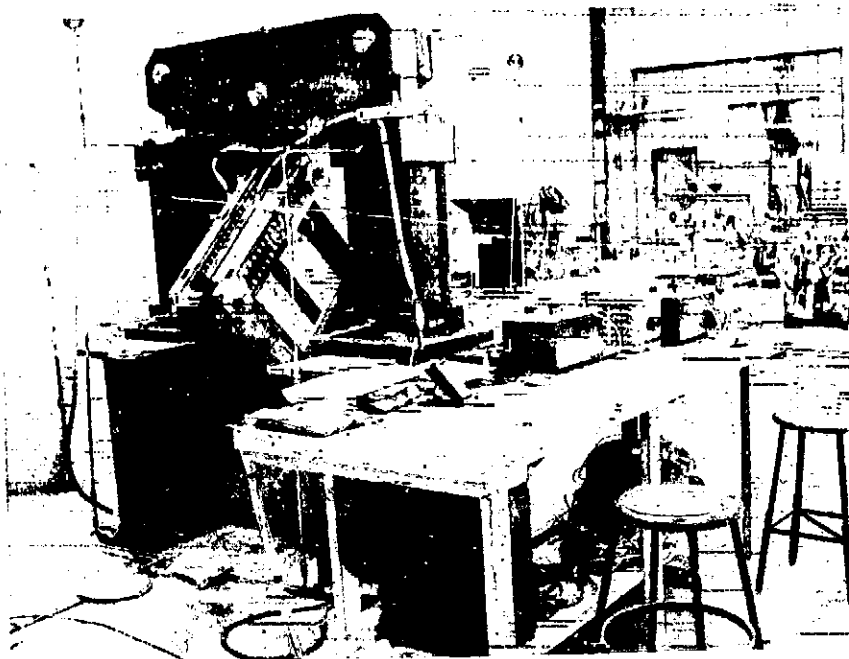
Test Set-Up Shear Panel Test.
